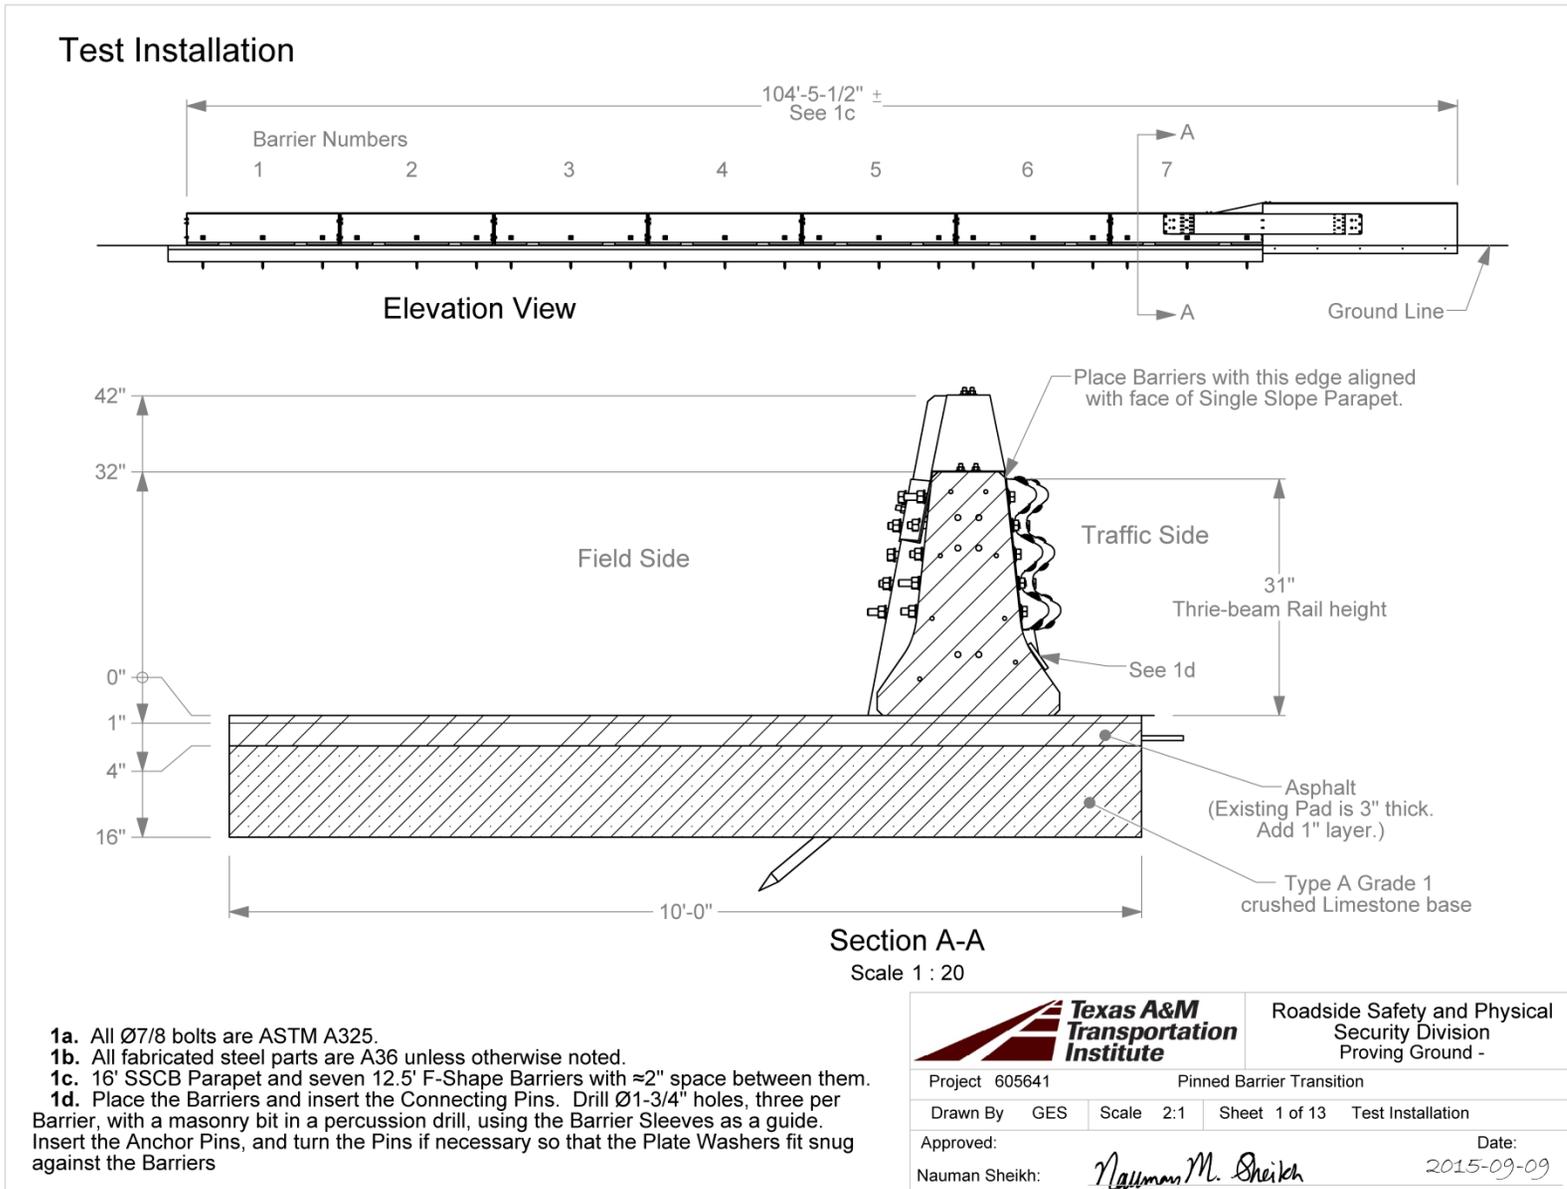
presents the general layout of the transition from temporary concrete barrier pinned on asphalt to rigid concrete barrier, and Figure 2.2 provides photographs of the installation. Appendix A provides further details of the installation.
